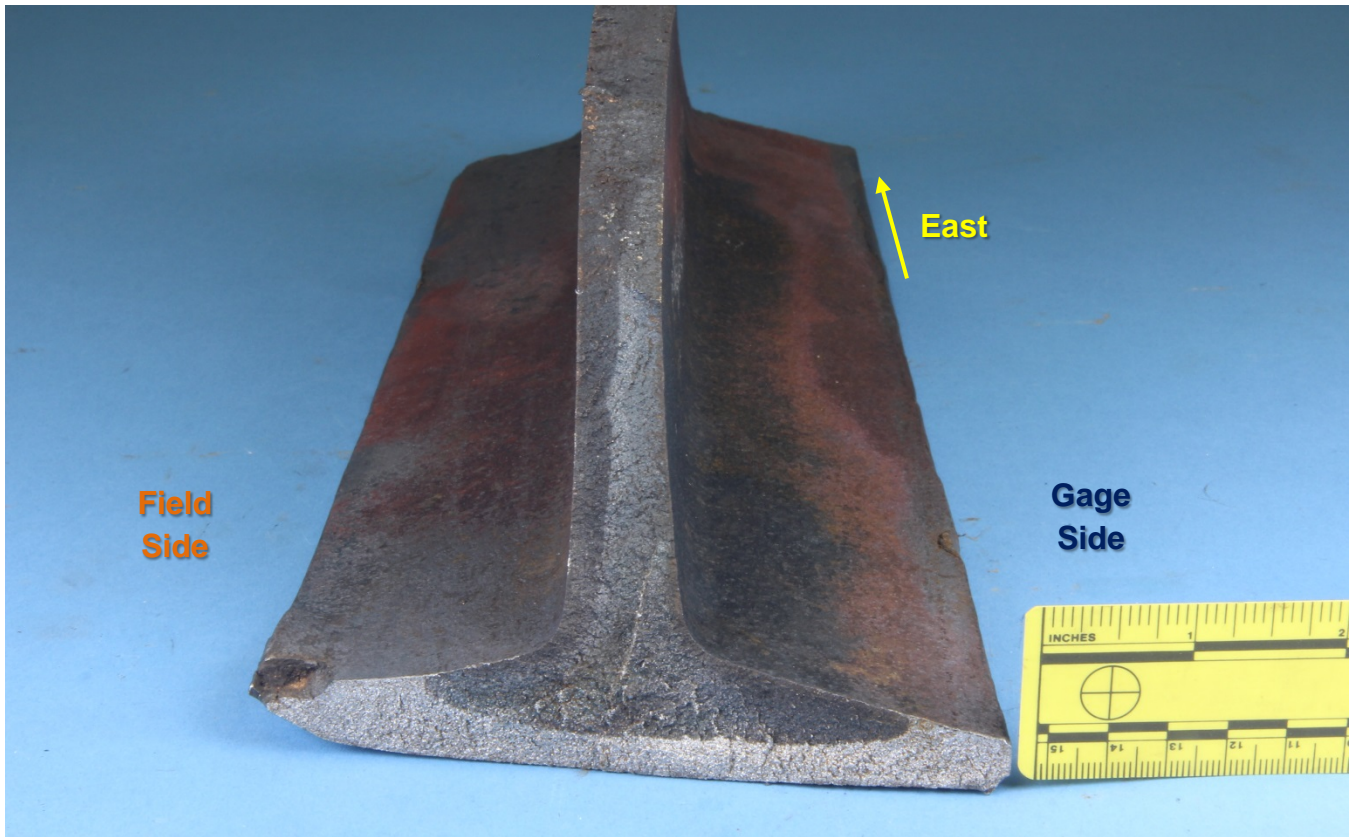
The 11N fracture surface that mates to the 10N fracture surface in Figure 36, after cleaning.
